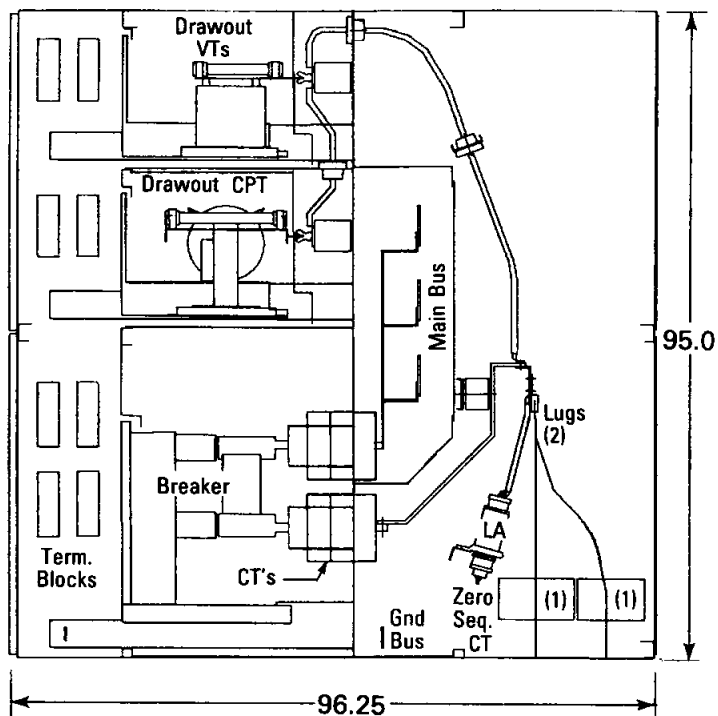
In. Wide Typical Auxiliary/Breaker Vertical Section
